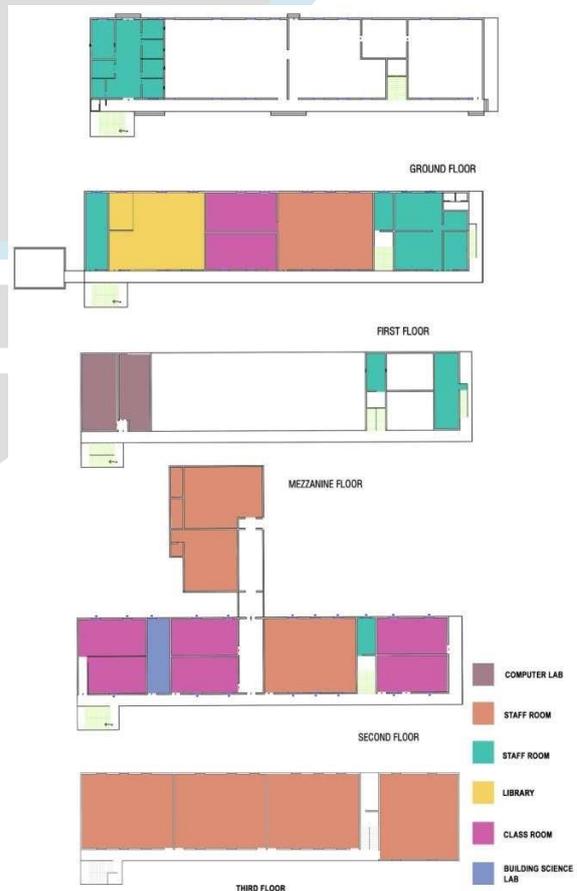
Floor plans showing the spatial configuration of the Department of Architecture, TKMCE
